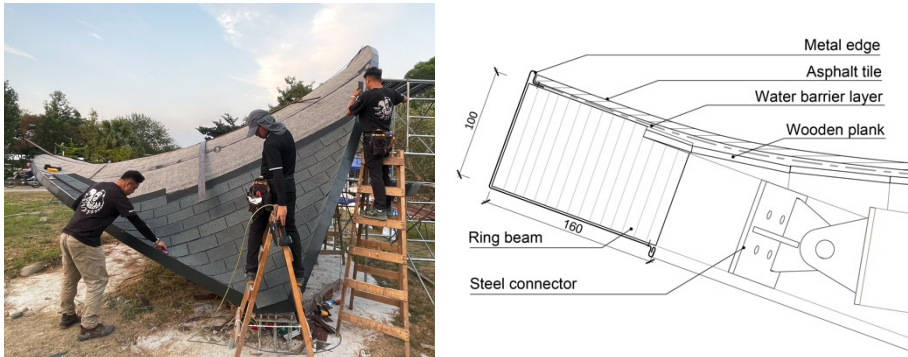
a) Installation of metal edge profile, water barrier and asphalt tiles, b) Sectional drawing of ring beam edge profile
